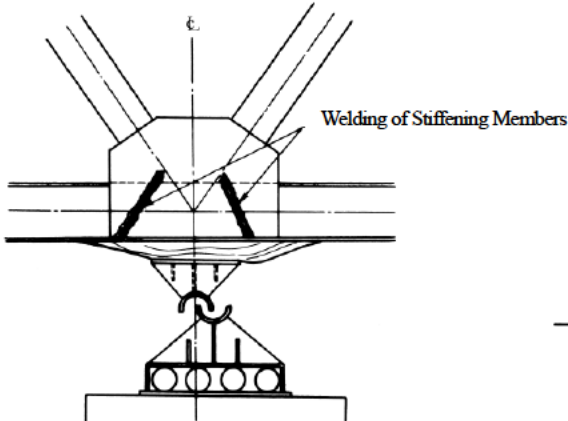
Installation of Stiffening Members (Example 1:Welding of Rib)
